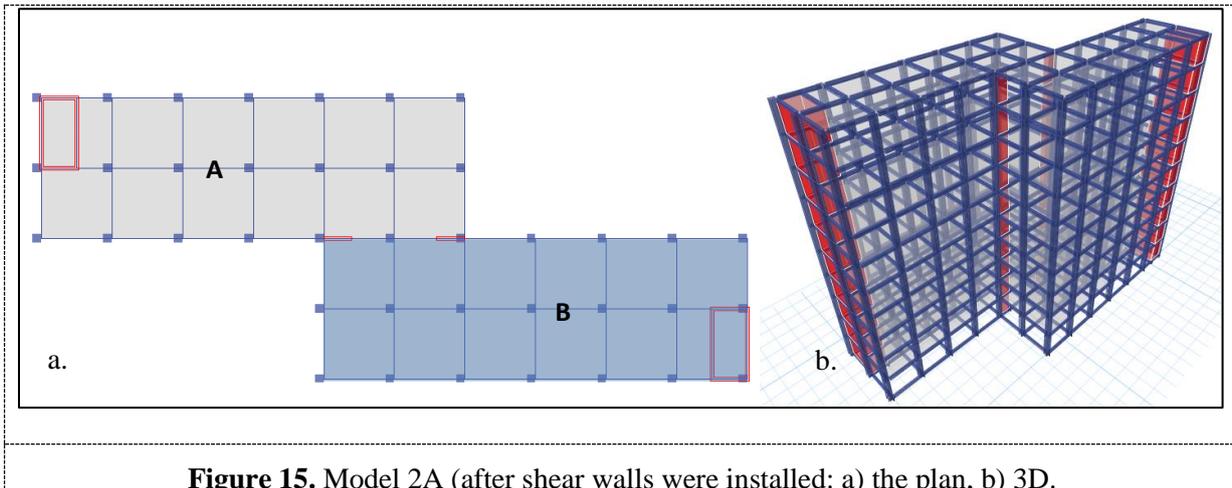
Model 2A (after shear walls were installed: a) the plan, b) 3D.
